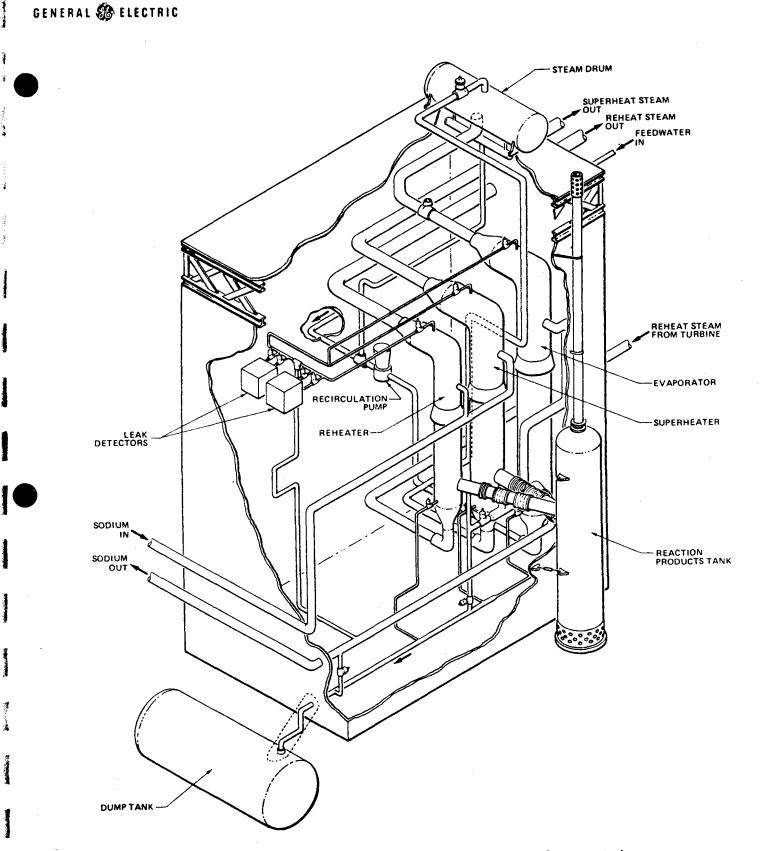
Steam Generator Building Conceptual Isometric
